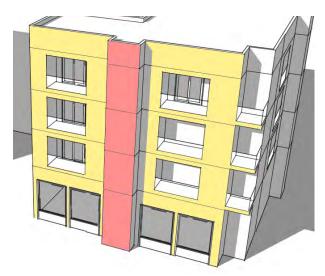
d.10 (1): No contiguous wall planes over 750 square feet.
